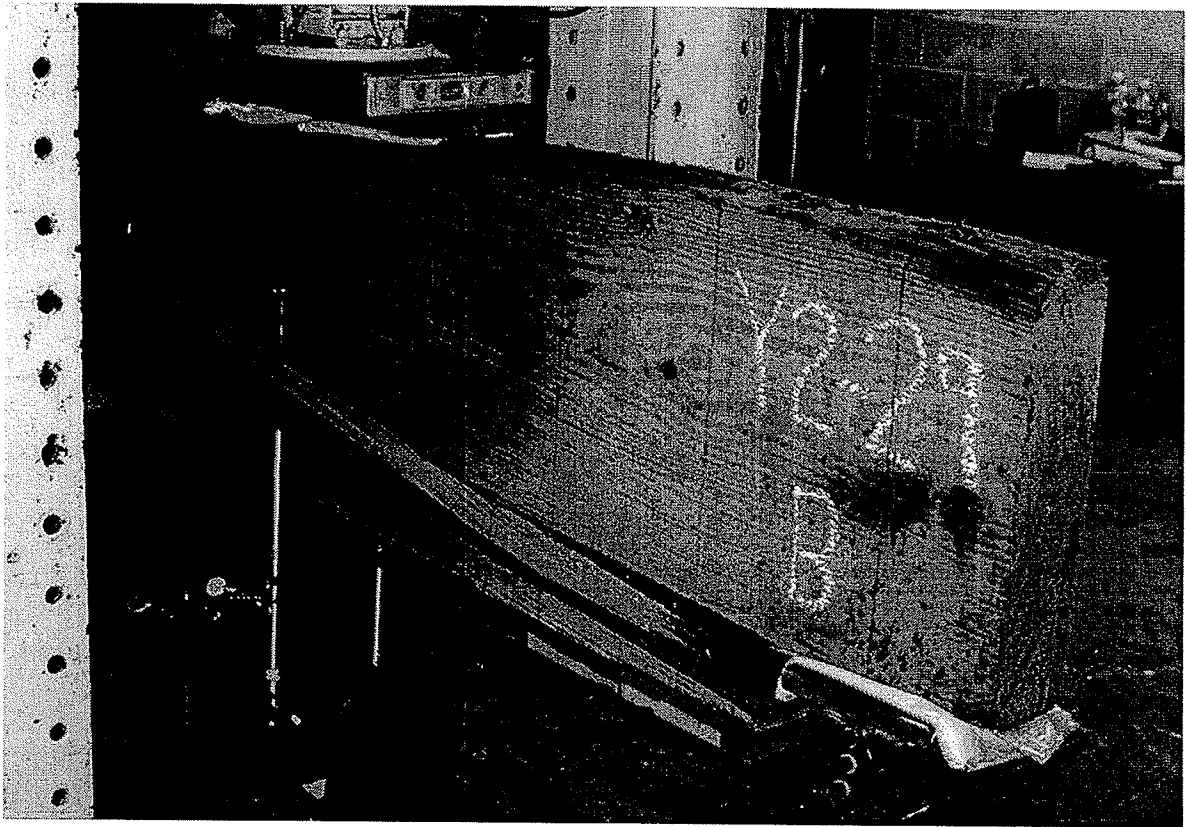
Example of dap splitting failure on specimen C9B (Y2-29B)
